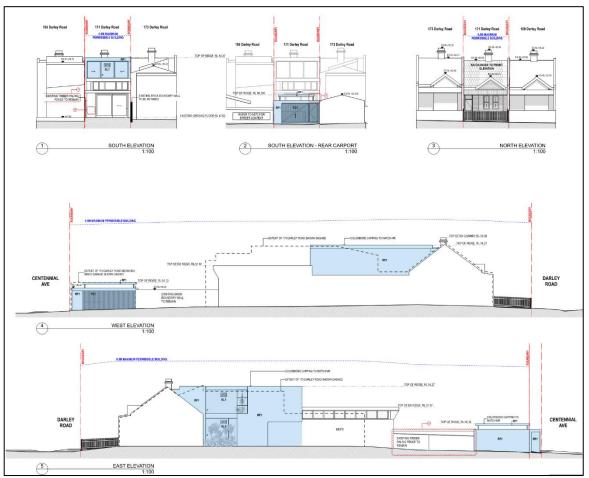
Extract of proposed Elevation Plans (Source: Ahron Best Architects).
